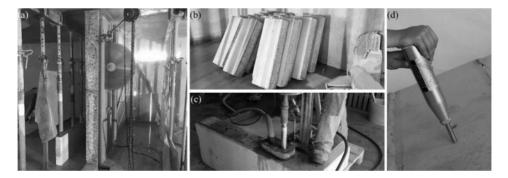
Cutting of a basement RC wall with a diamond saw, (b) stock of cut blocks, (c) drilling of holes for the post-tensioning cables, (d) rebound hammer testing.
